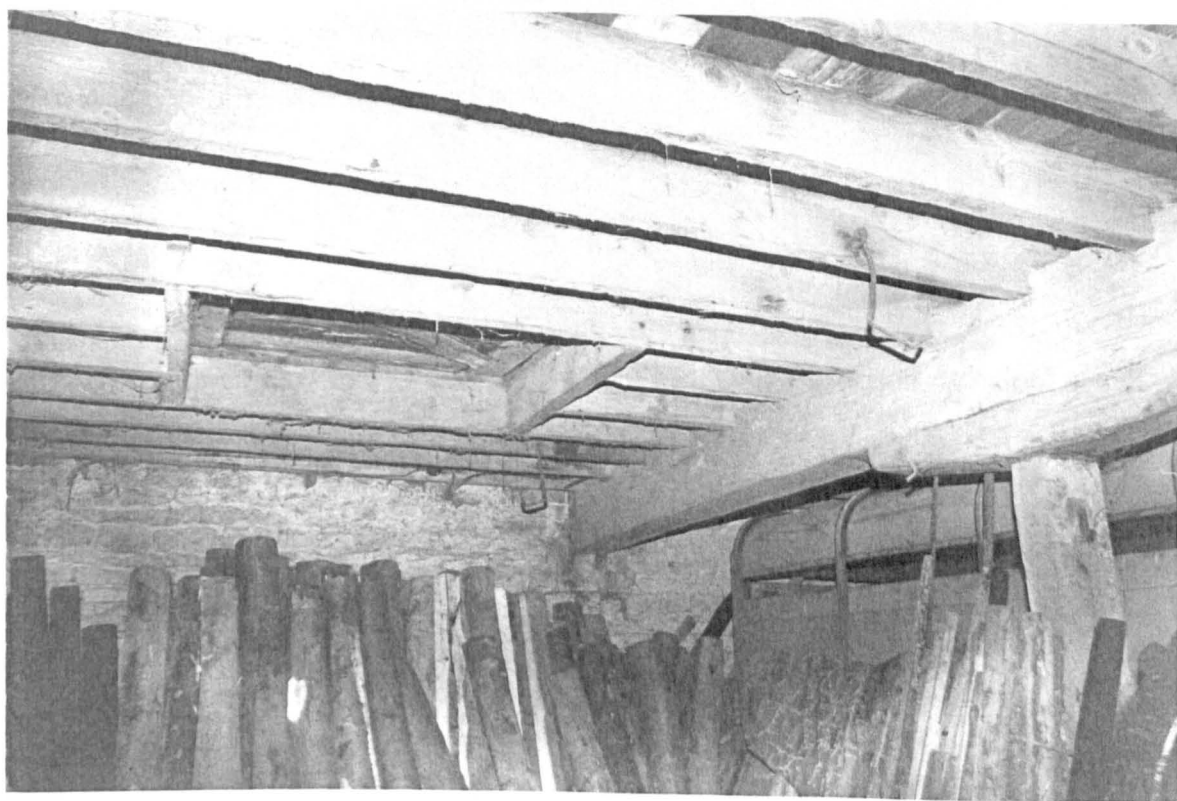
Trap door from granary to waggon shed, Hall Farm, South Rauceby
